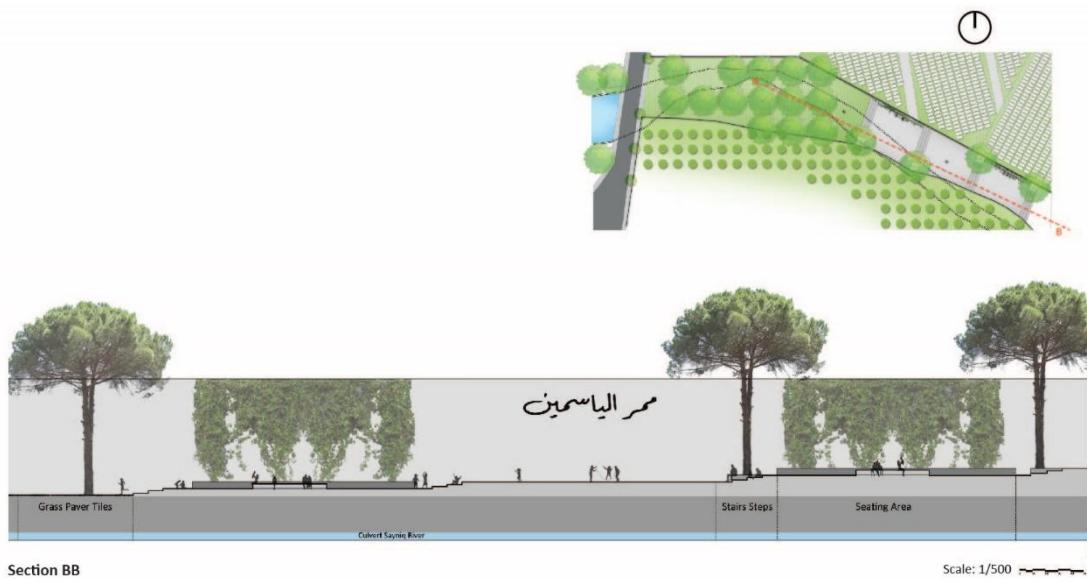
Ein El Helweh Reflection Garden, Site 2, Section. Source: Author
